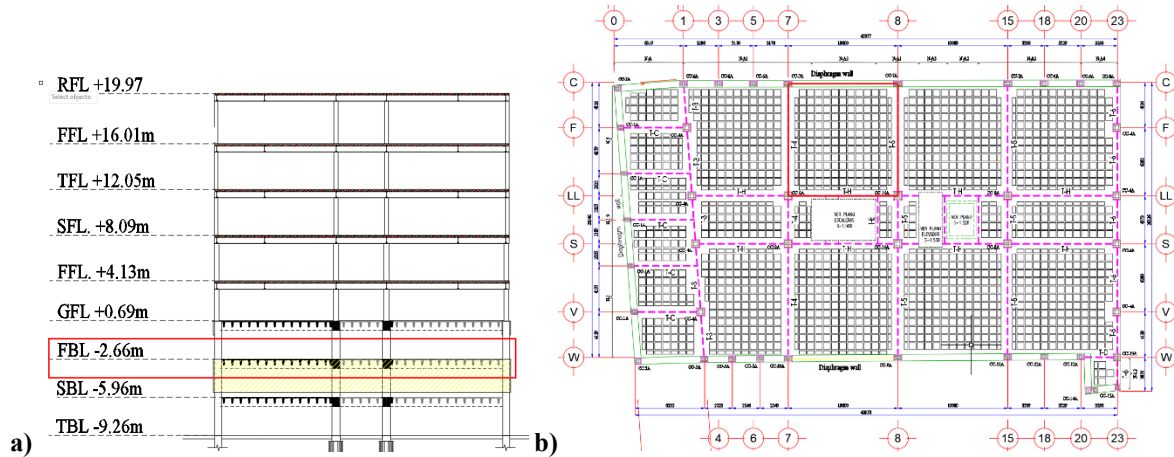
Building: a) stories and b) location of the interior waffle slab panel at first basement floor (taken from).
